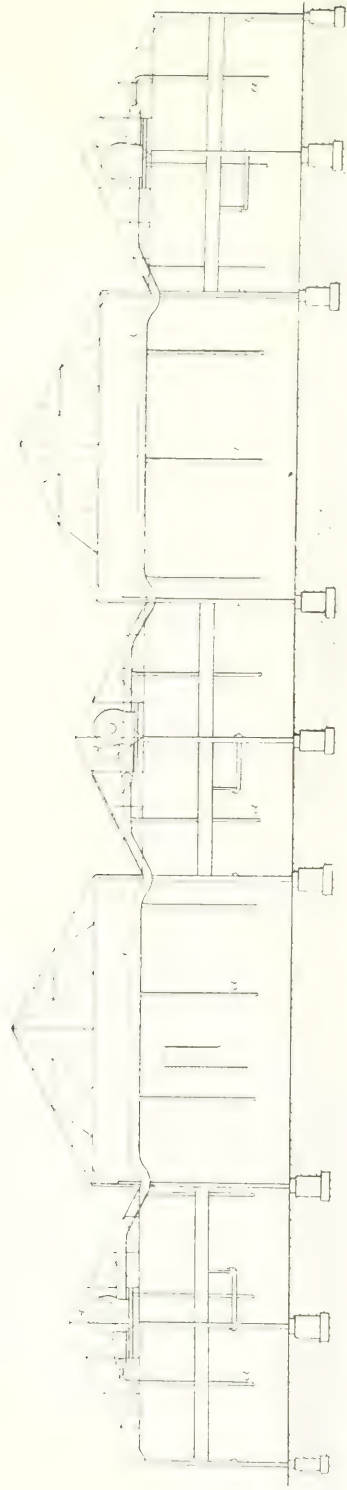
END ELEVATION, BRITISH WESTINGHOUSE WORKS, SHOWING PLANTS IN POSITION IN ROOF TRUSSES, AND THE VERTICAL AIR PIPES.
